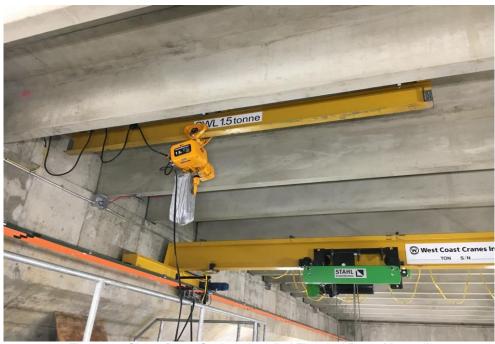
Clover Pump Station - Installed Electrical Room Monorail.
